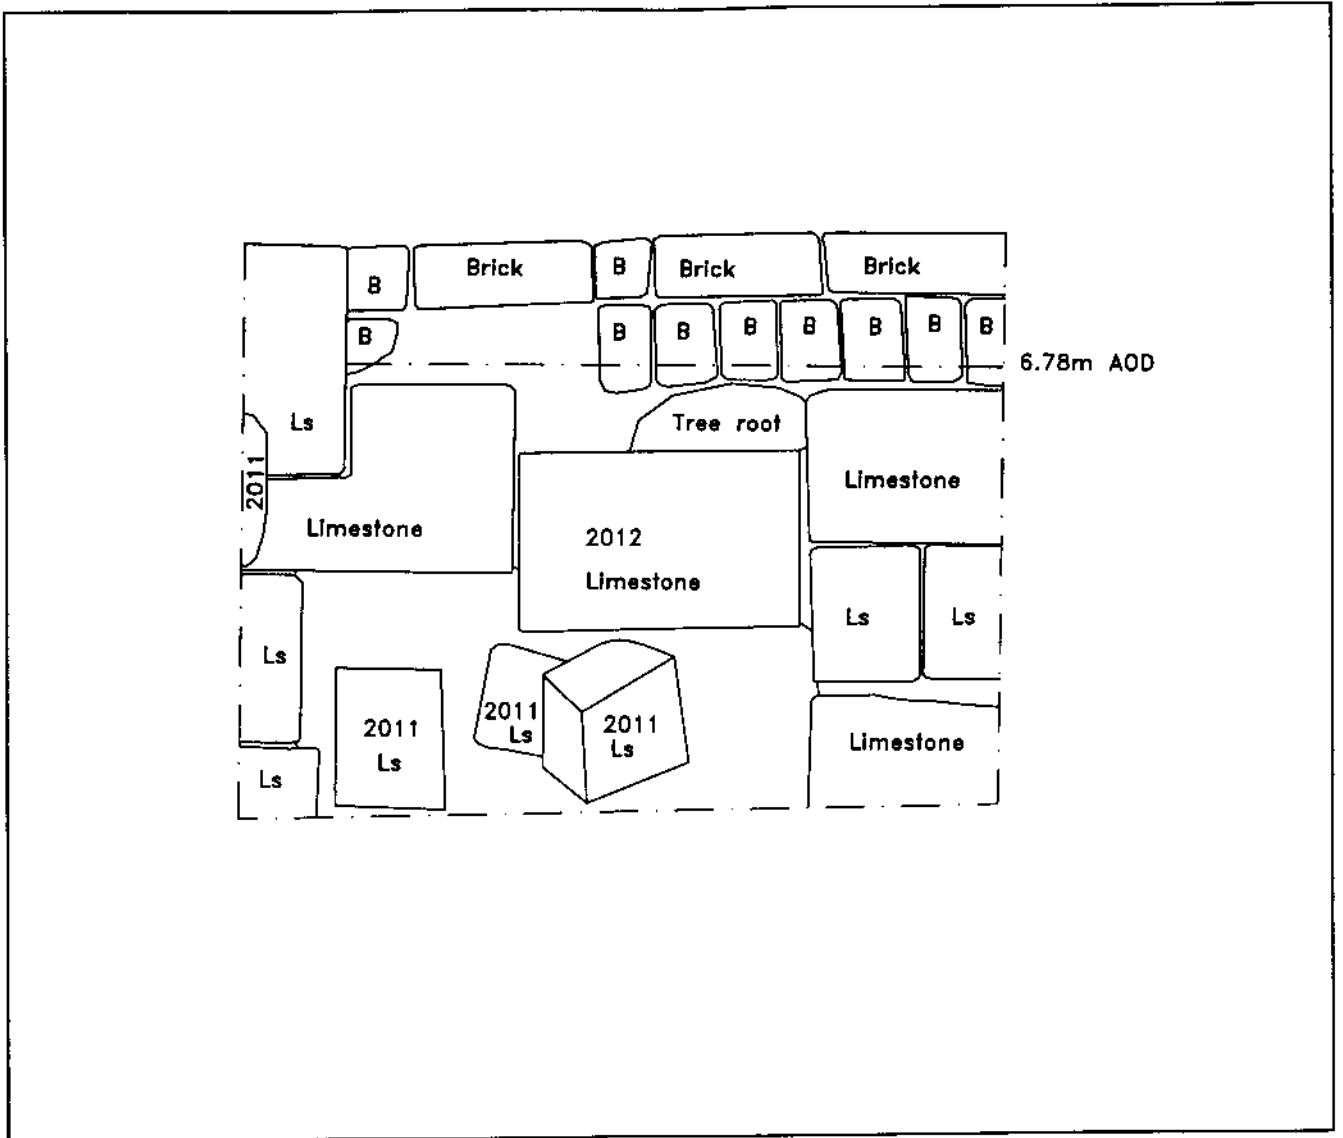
Section 3 - West facing section of context 2012 scale 1:10
